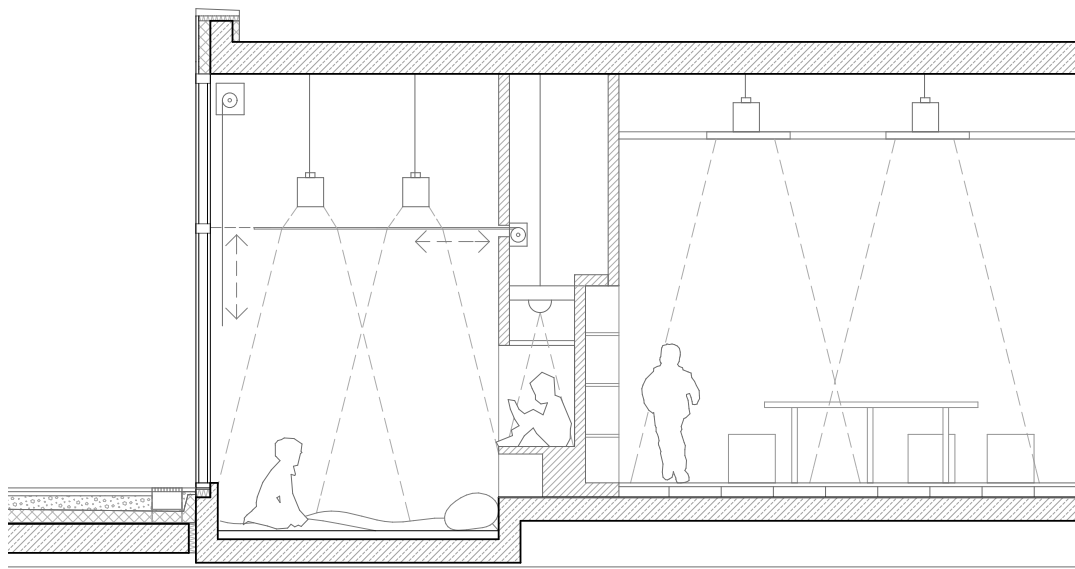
Classroom fragment. Escape space section b-b 1:50
